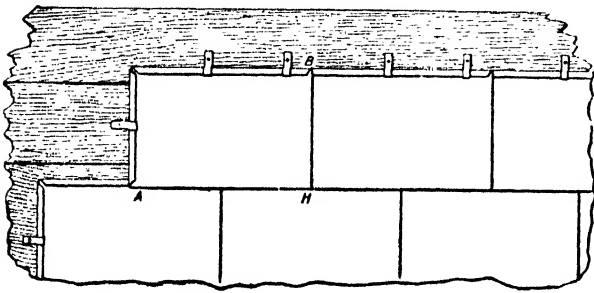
Sheets Fastened to Roofs with Cleats Properly Placed
